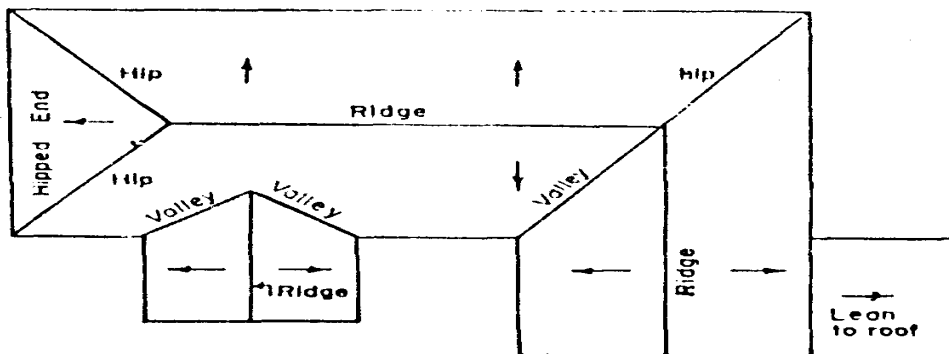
FIG VIEW OF A BUILDING WITH BASIC SLOPING ROOFS
